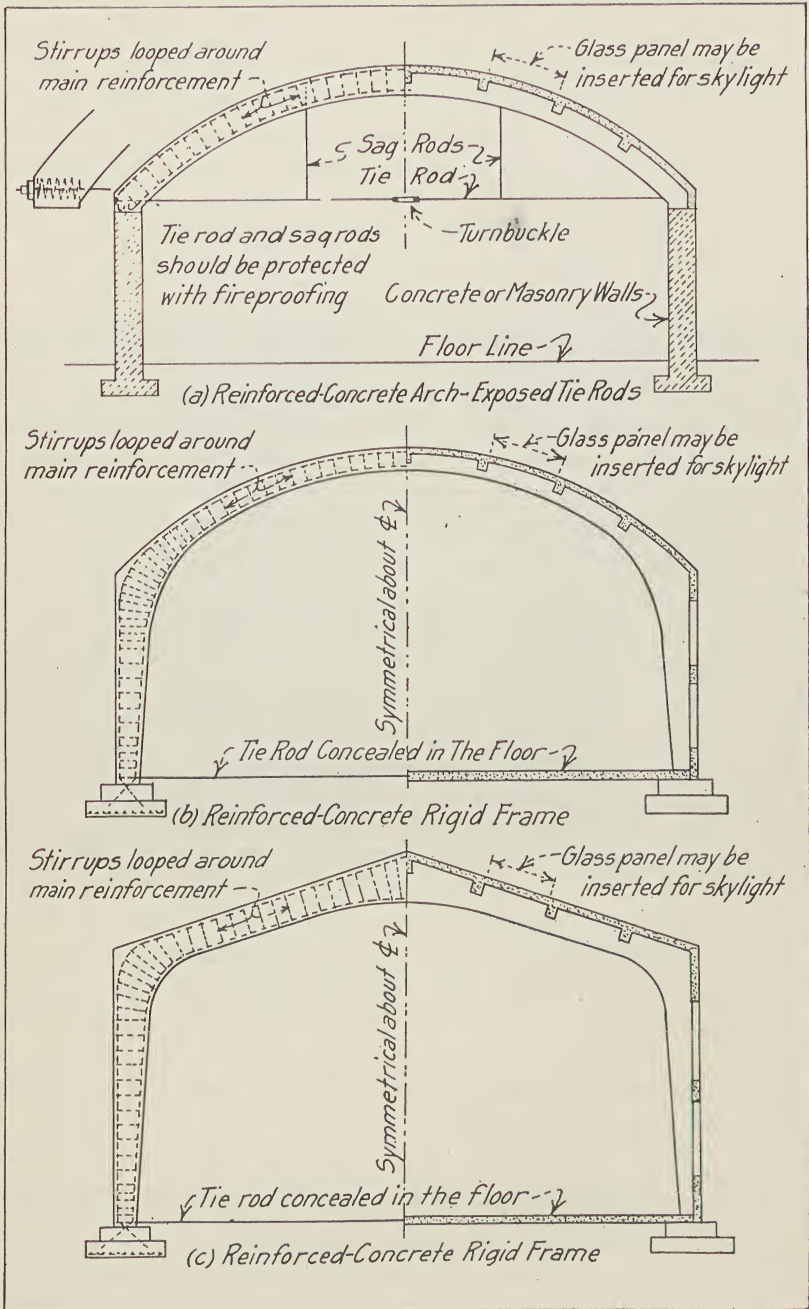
Simple Reinforced-concrete Arches and Rigid Frames
